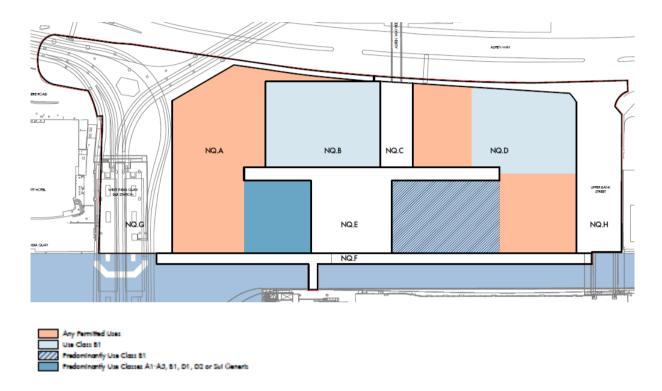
Land Uses – Upper Levels (above First Floor) Parameter Plan
